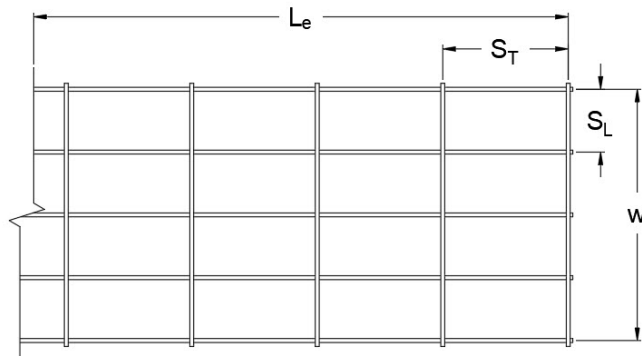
Soil-Reinforcing – Grid (Plan View)
